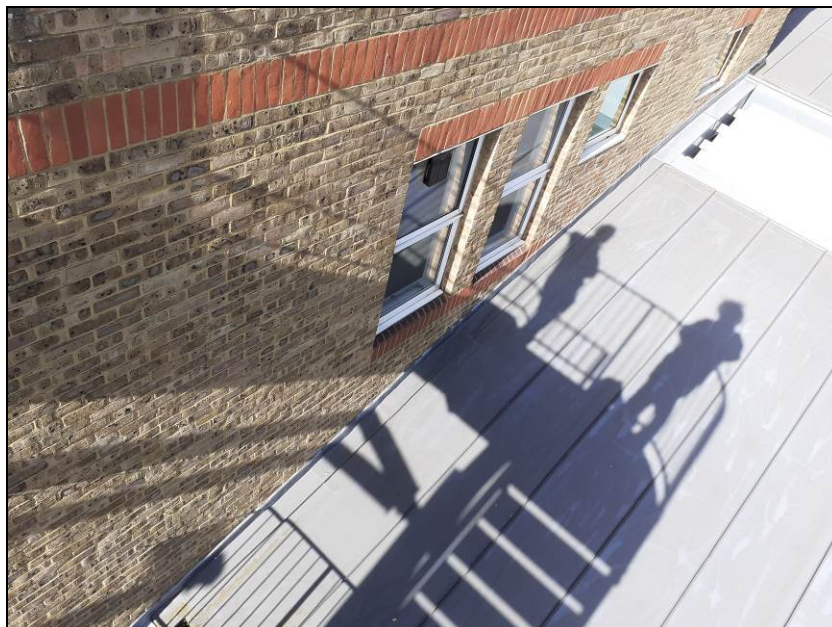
Lead flashing at the intersection of the Science Laboratory roof and Building C.
